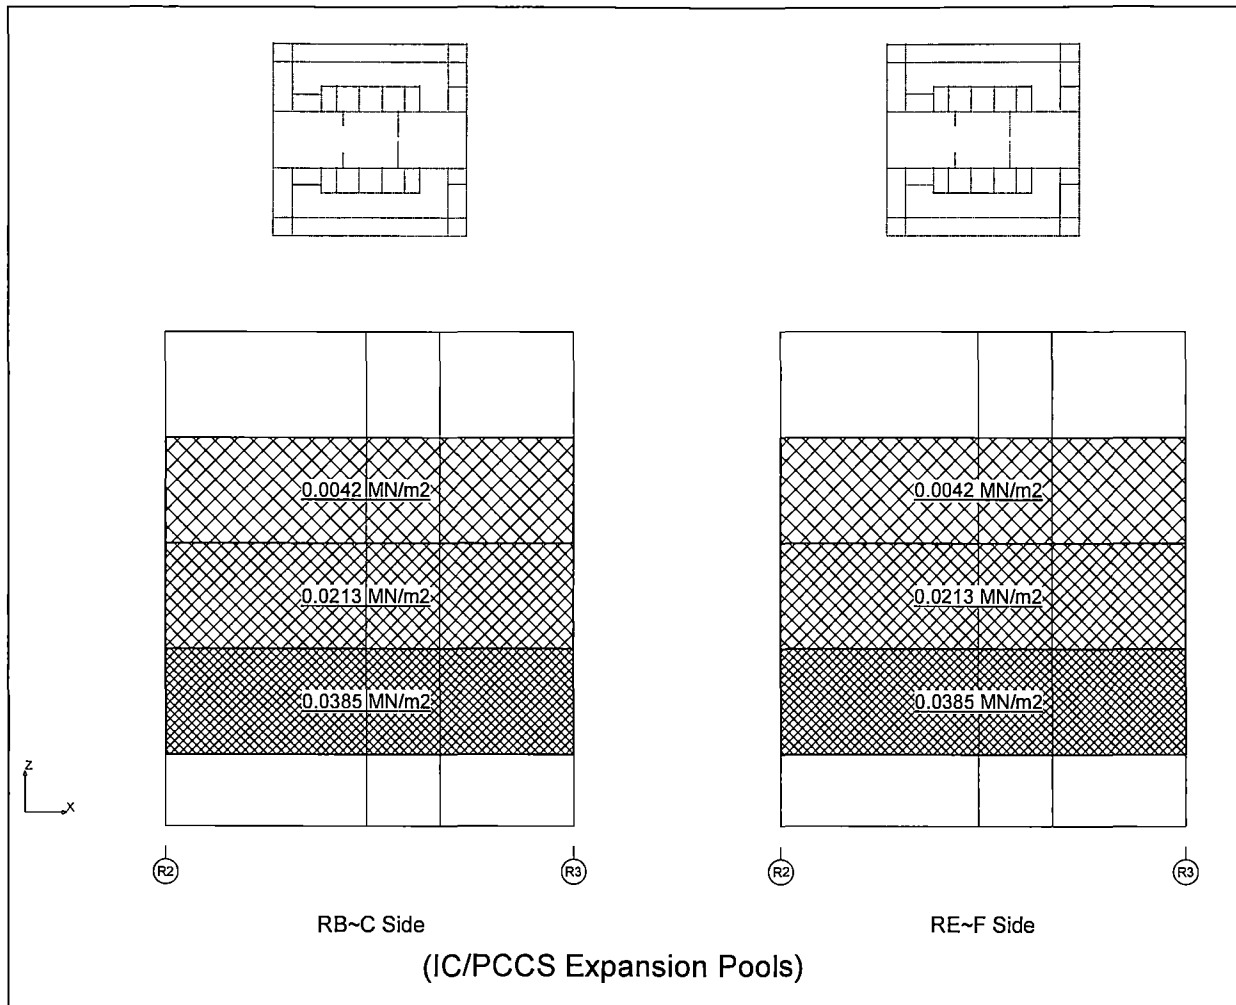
Hydrostatic Loads on the Inner Wall at EL 27,000 (1)
